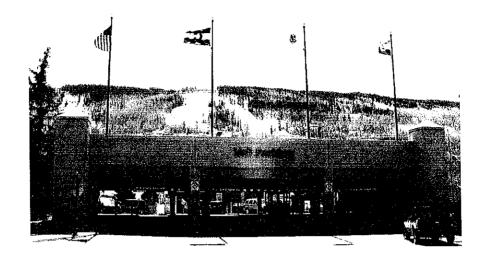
Vail Transportation Center Parking Structure main entrance on north side.
